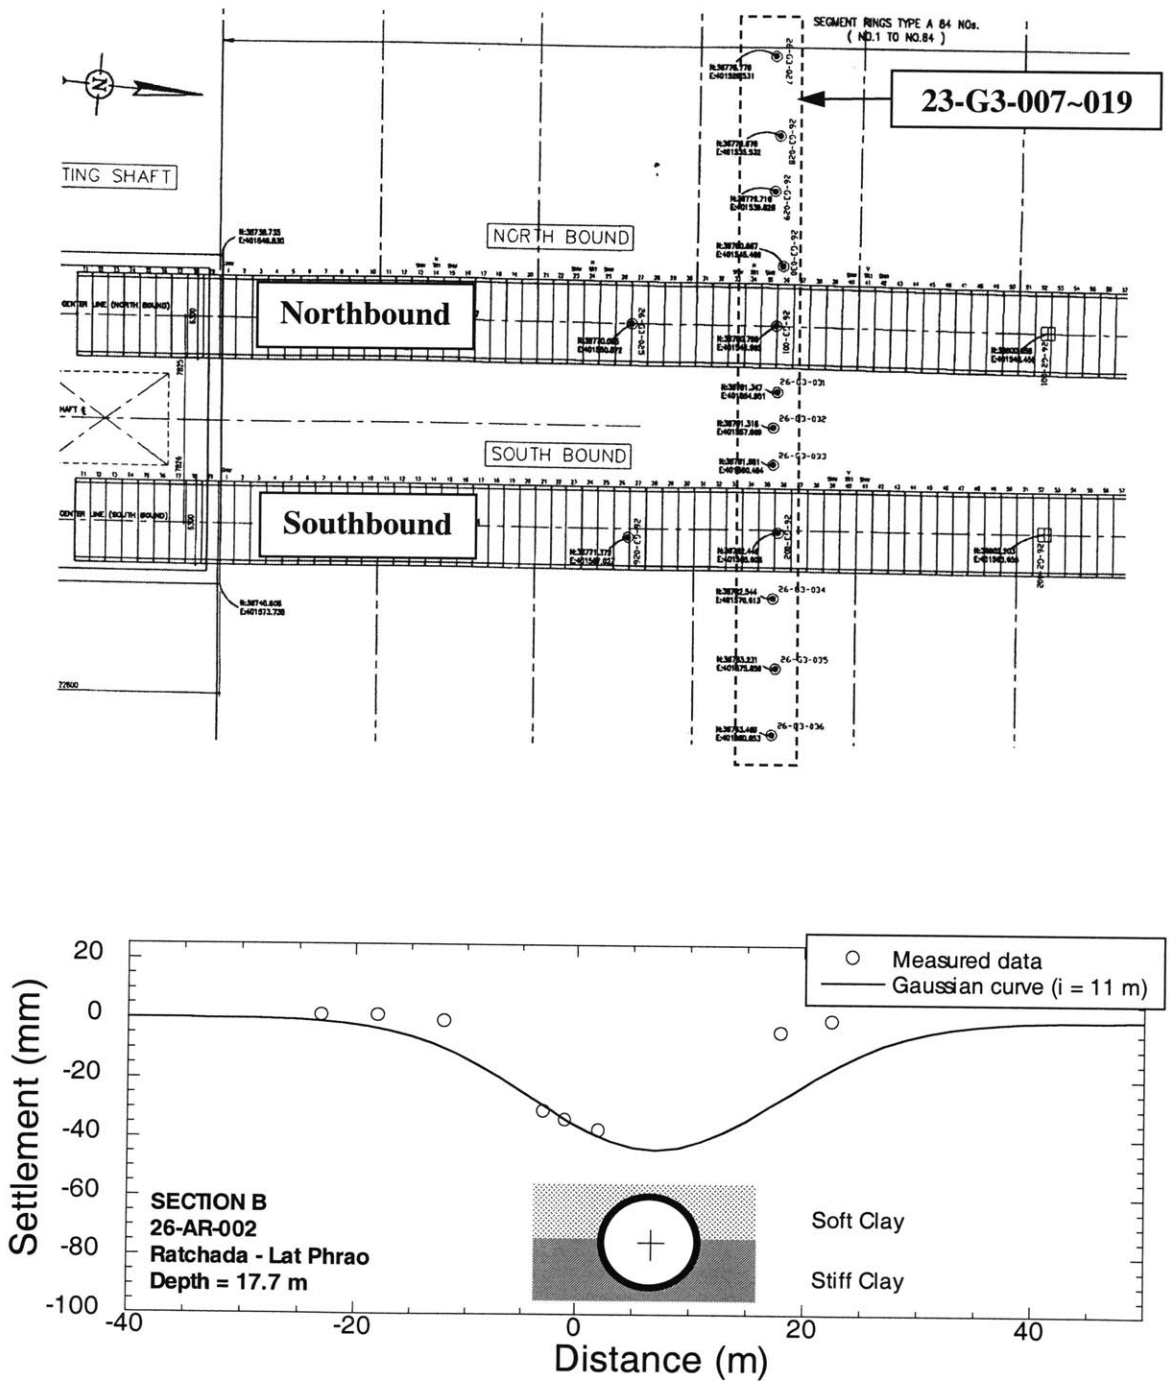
Surface settlement trough measured on 26-AR-002 (southbound tunnel-Ring no.36) and the instrumentation layout
